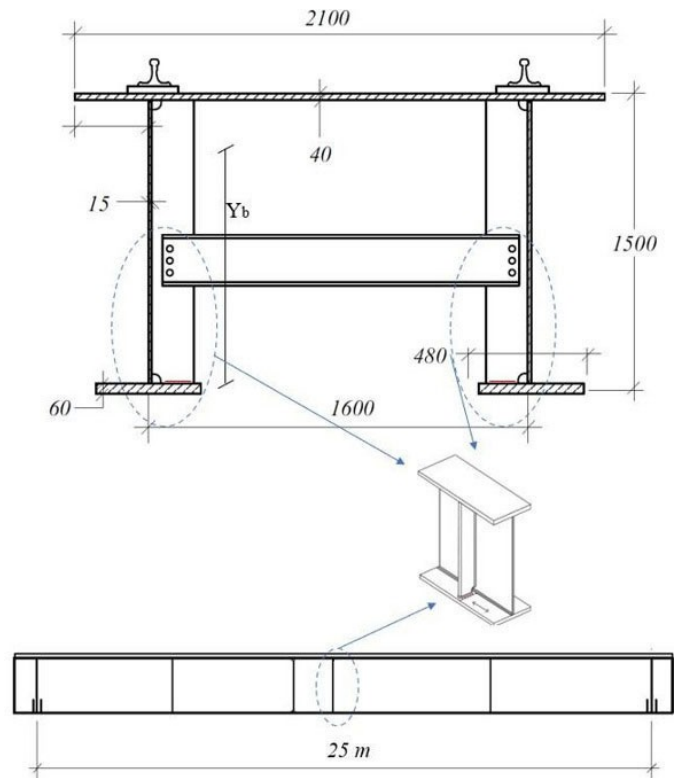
Top: The railway bridge girder. Bottom: Elevation view of the bridge [4]
